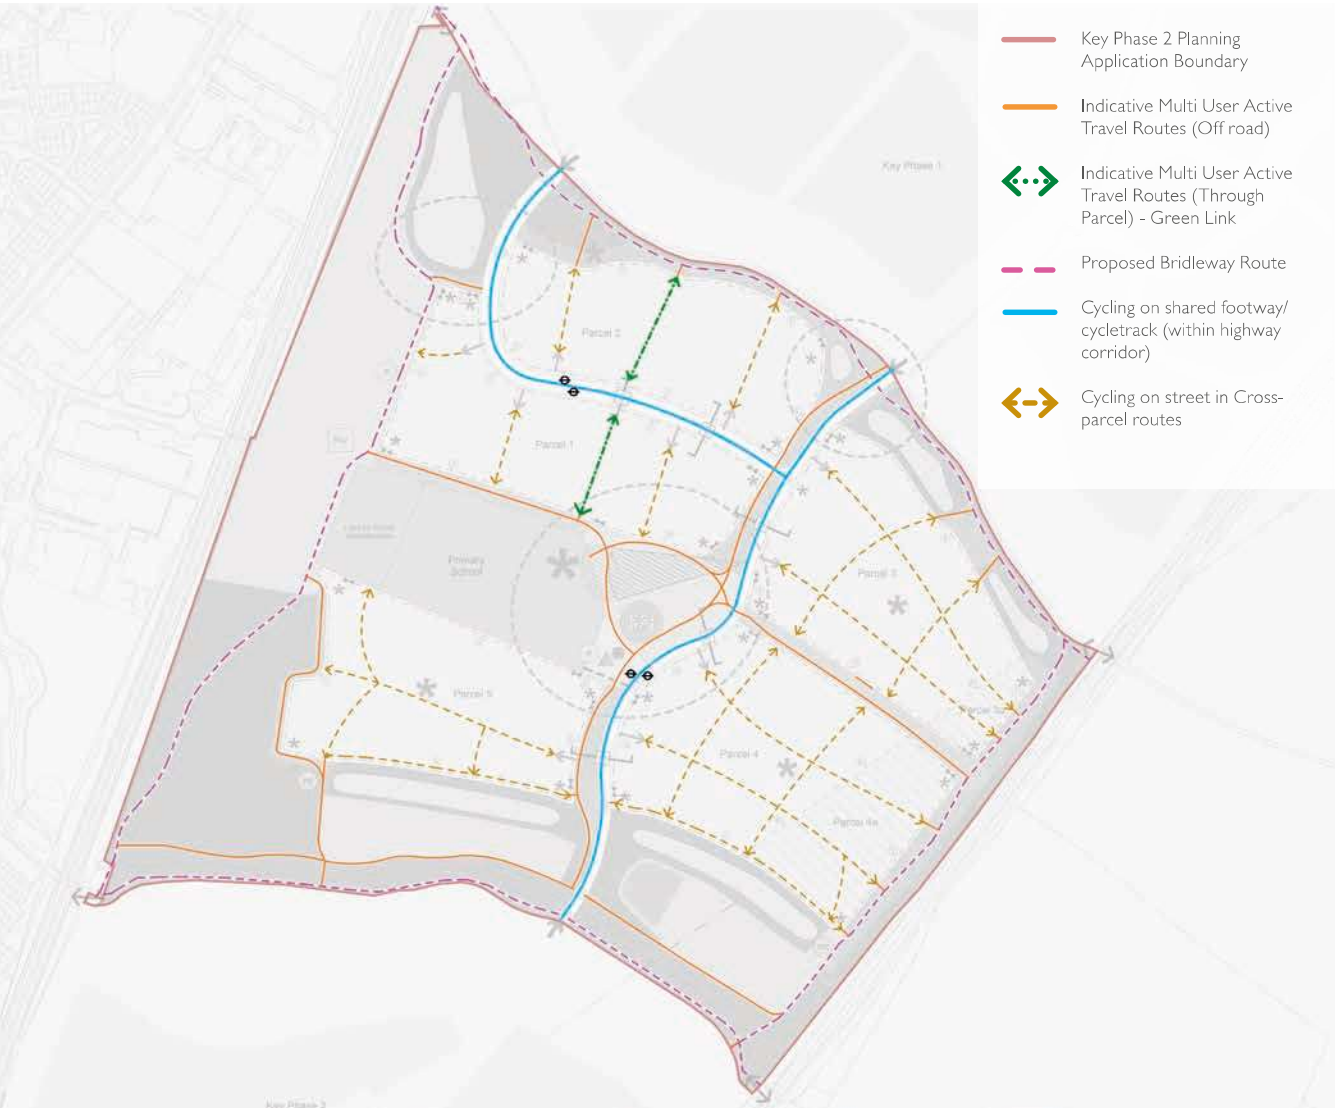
Cycleways, Footpaths & Bridleway Hierarchy Plan
